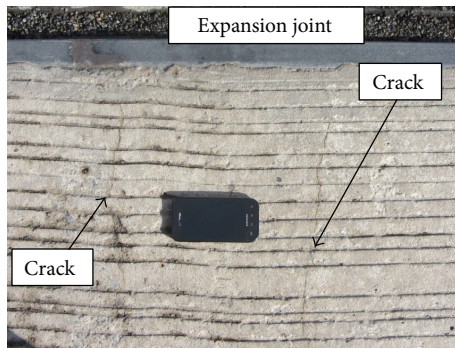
Early age longitudinal concrete cracking on concrete adjacent to bridge deck dam rehabilitations (cell phone: 4.5×2 inches for comparison).
